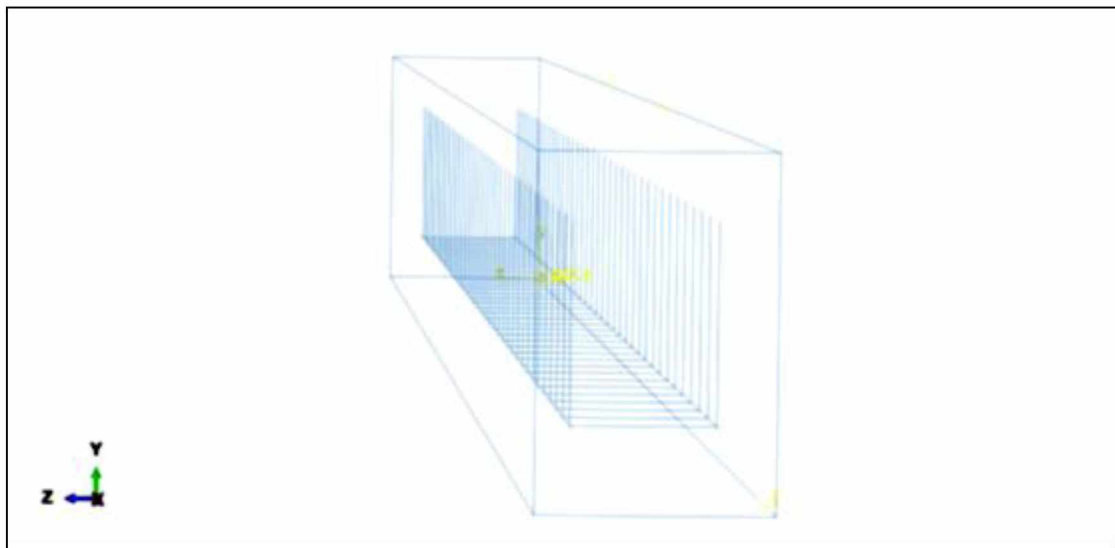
Open Leg Stirrup Embedded in B1RC Beam
